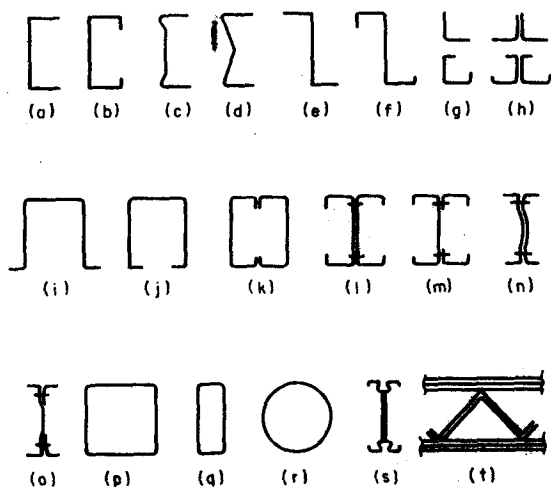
Cold-formed sections used in structural framing.^{1,6}
